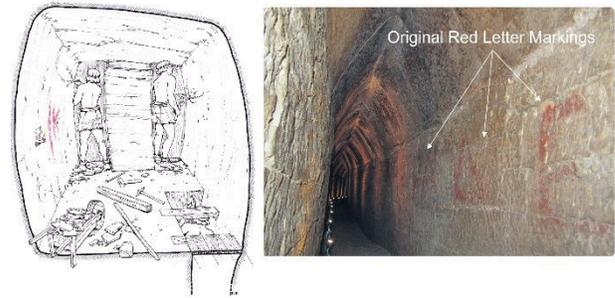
Left: Excavation by hand. Two workers working side by side. Right: Ancient symbols and letters painted on the tunnel walls to denote the tunnel chainage as well as the location of the vertical shafts.
